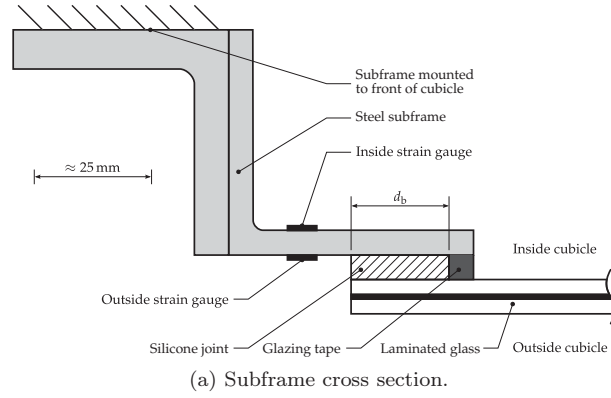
Cross section of edge fixing and strain gauge arrangement.
